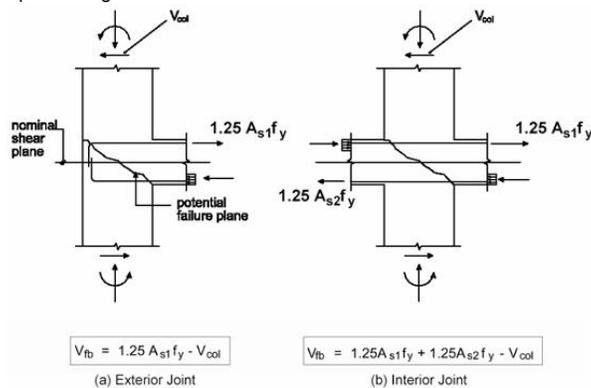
Determining Factored Shear Force in Joints
